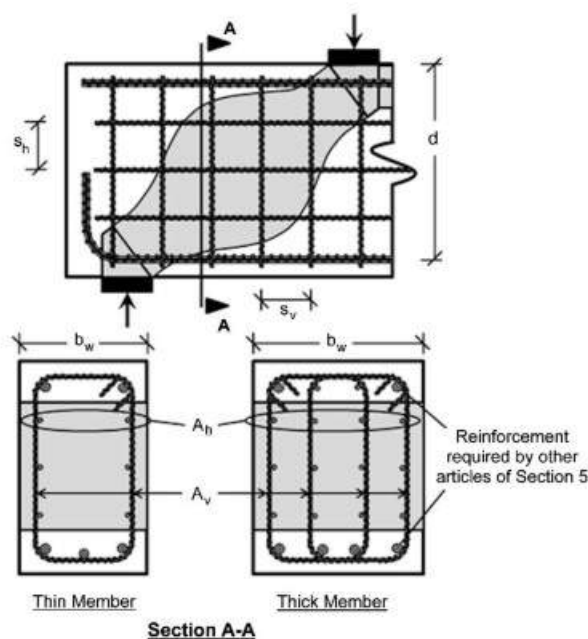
Distribution of Crack Control Reinforcement in Struts
